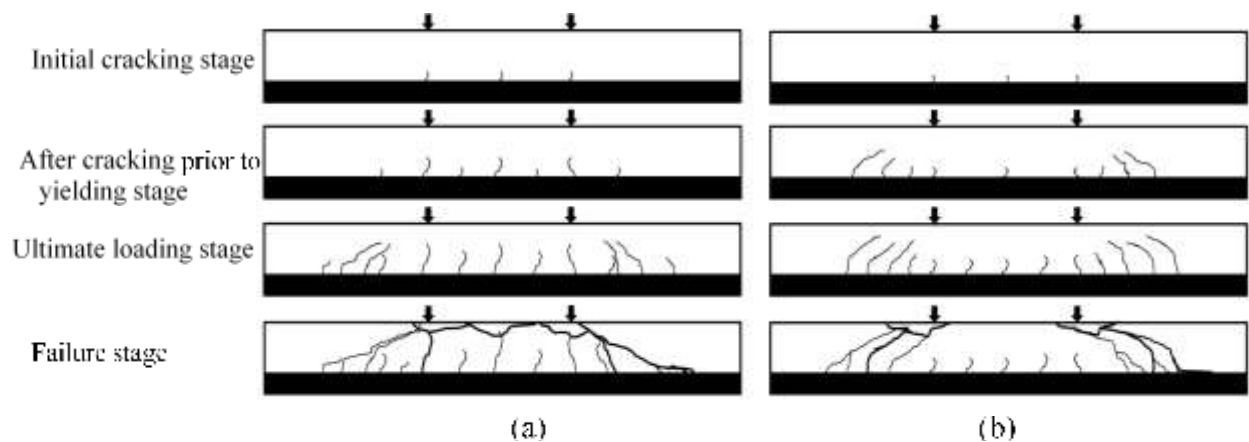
Typical cracking and failure modes of beams (a) low to medium prestress level (Groups P0, P25 and P50) (b) high prestress level (Groups P75 and P100)
